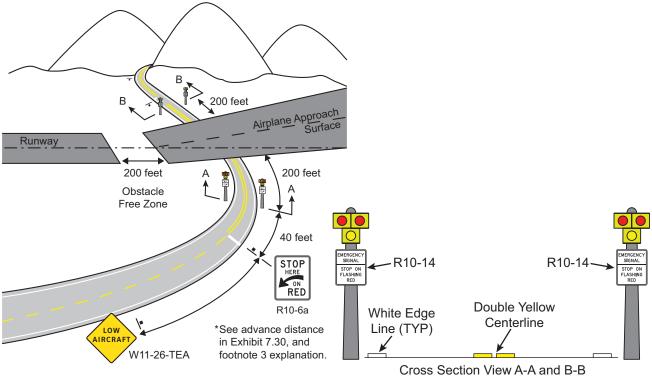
Low Flying Aircraft Hybrid Beacon Layout
